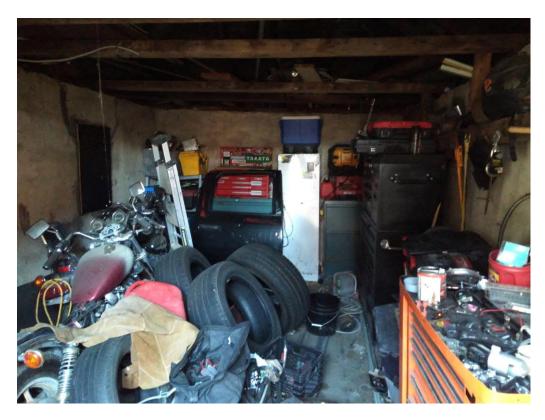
View of basement in 18 Elizabeth Street dwelling.
